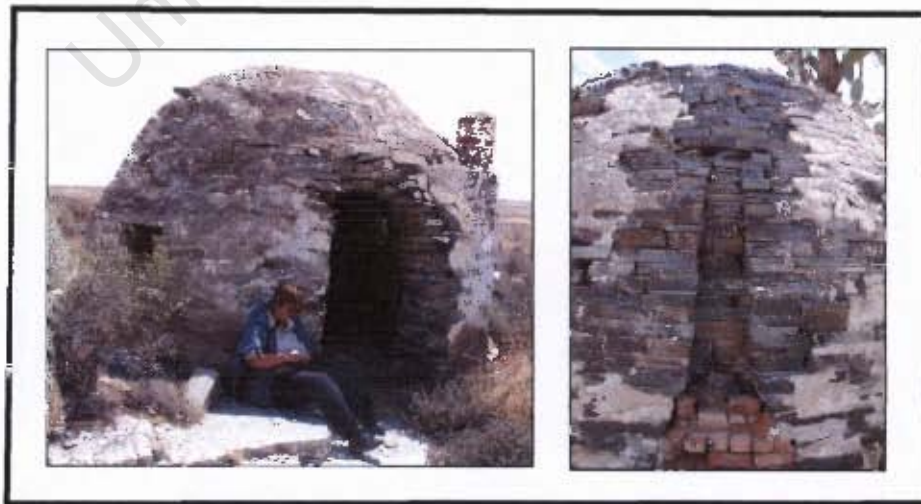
Vastrap. Floor laid with stone slabs.
